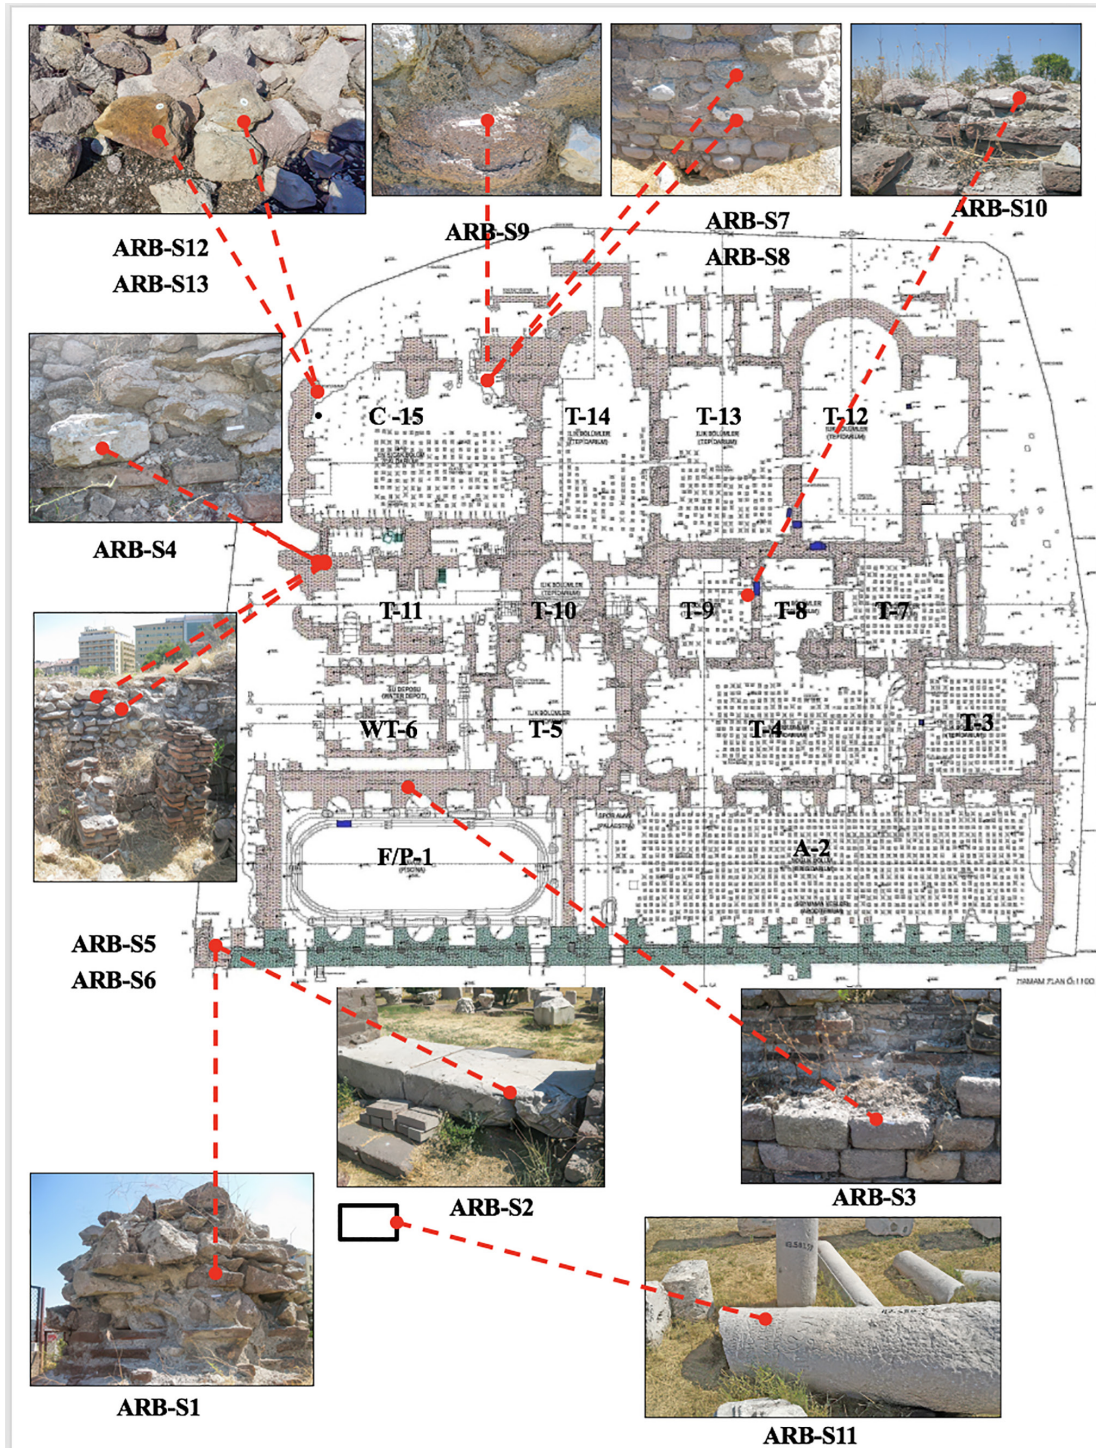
Stone sample photographs on the site plan (photos: Tanrıverdi, 2018).
